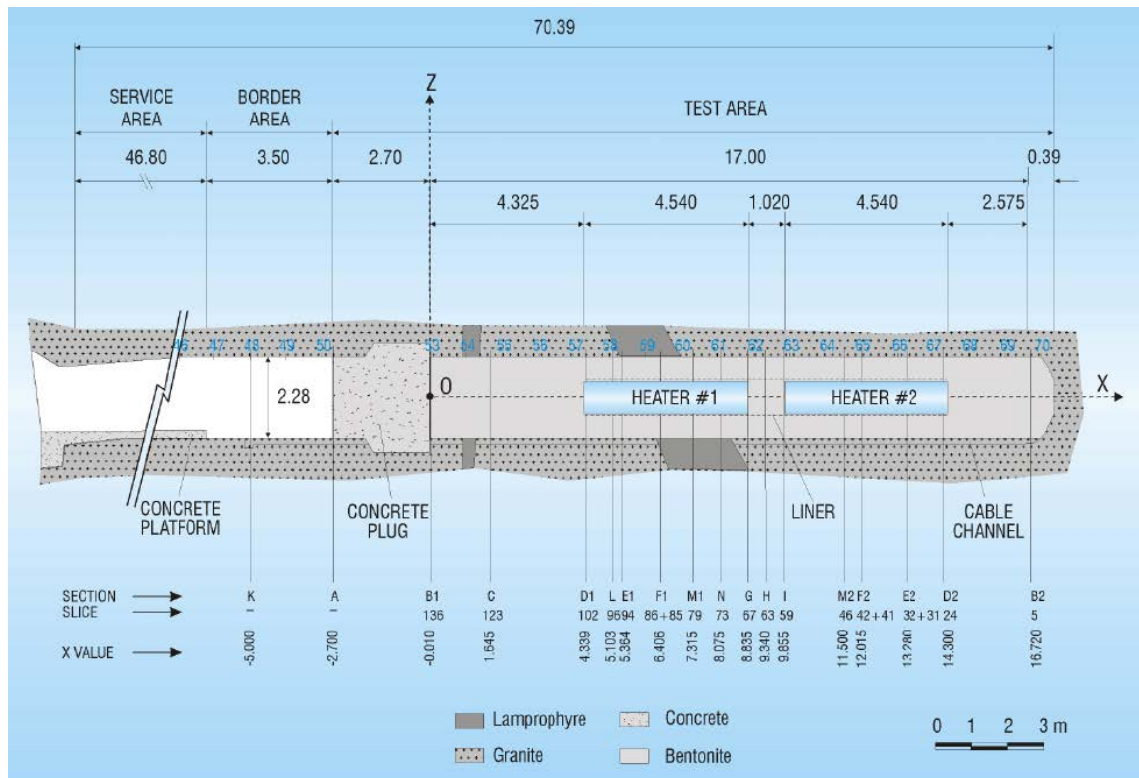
General layout of the FEBEX test (Bárcena et al. 2003).
